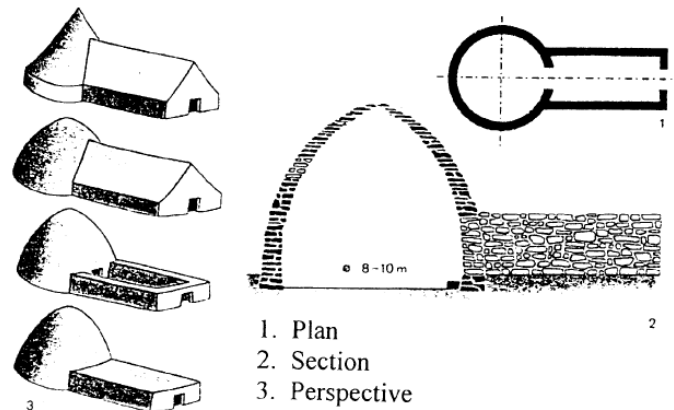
Domed building forms found at Mesopotamia excavations belonging to 7th century B.C.
